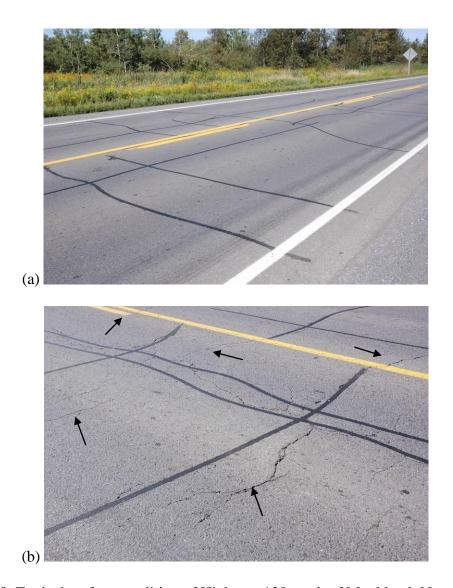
Typical surface condition of Highway 138 north of Monkland. <u>Note</u>: Arrows indicate additional cracks that appeared after the initial sealing.
